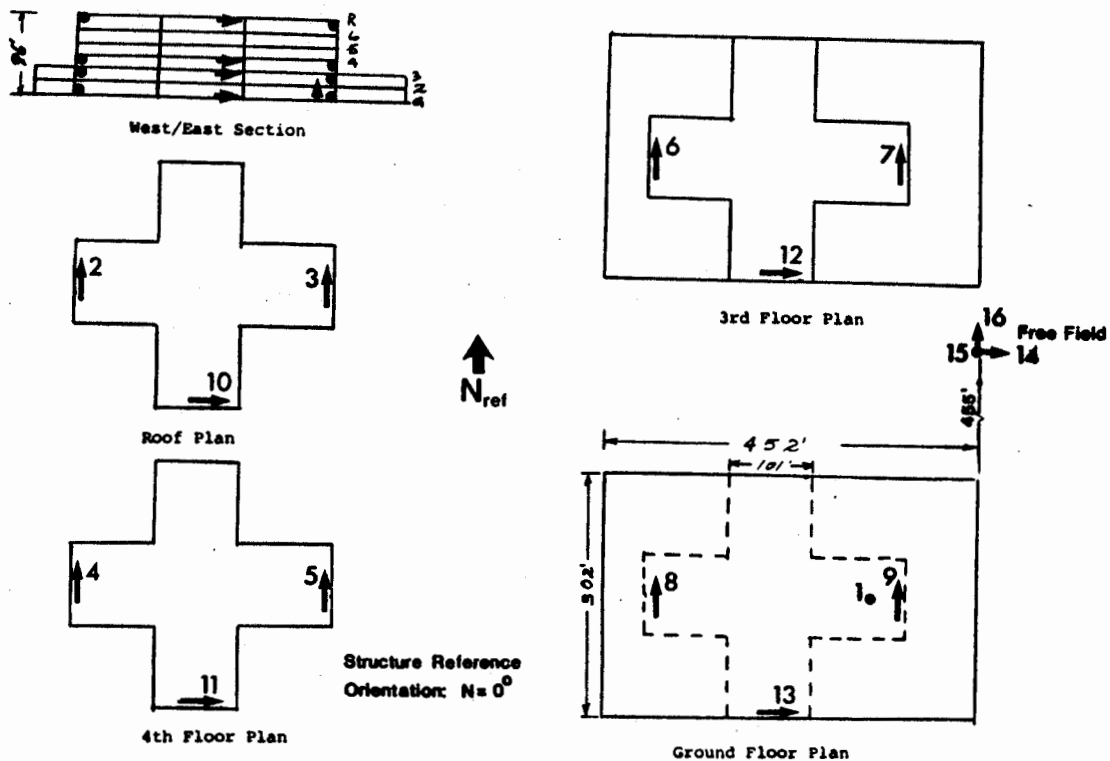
Structural Configuration and Instrumentation for Building Two - Six Story Hospital [3]
